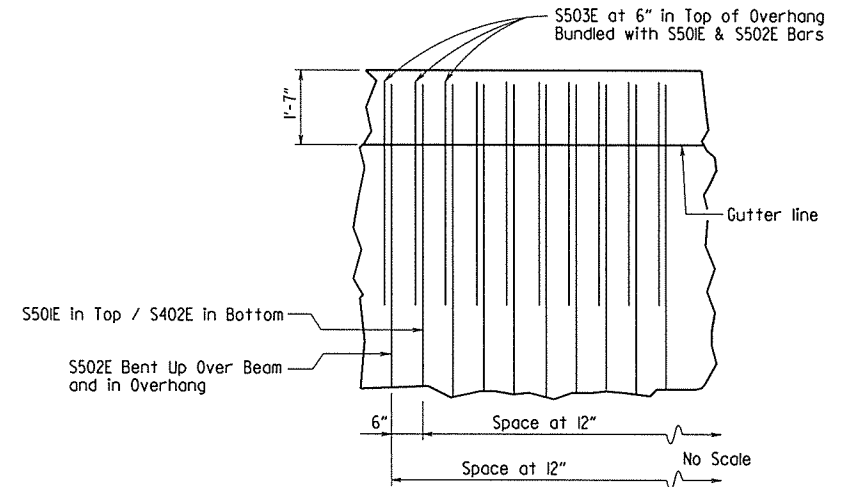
DETAILS OF ALTERNATE ANCHORS AND PLACEMENT OF LONGITUDINAL REINFORCEMENT
